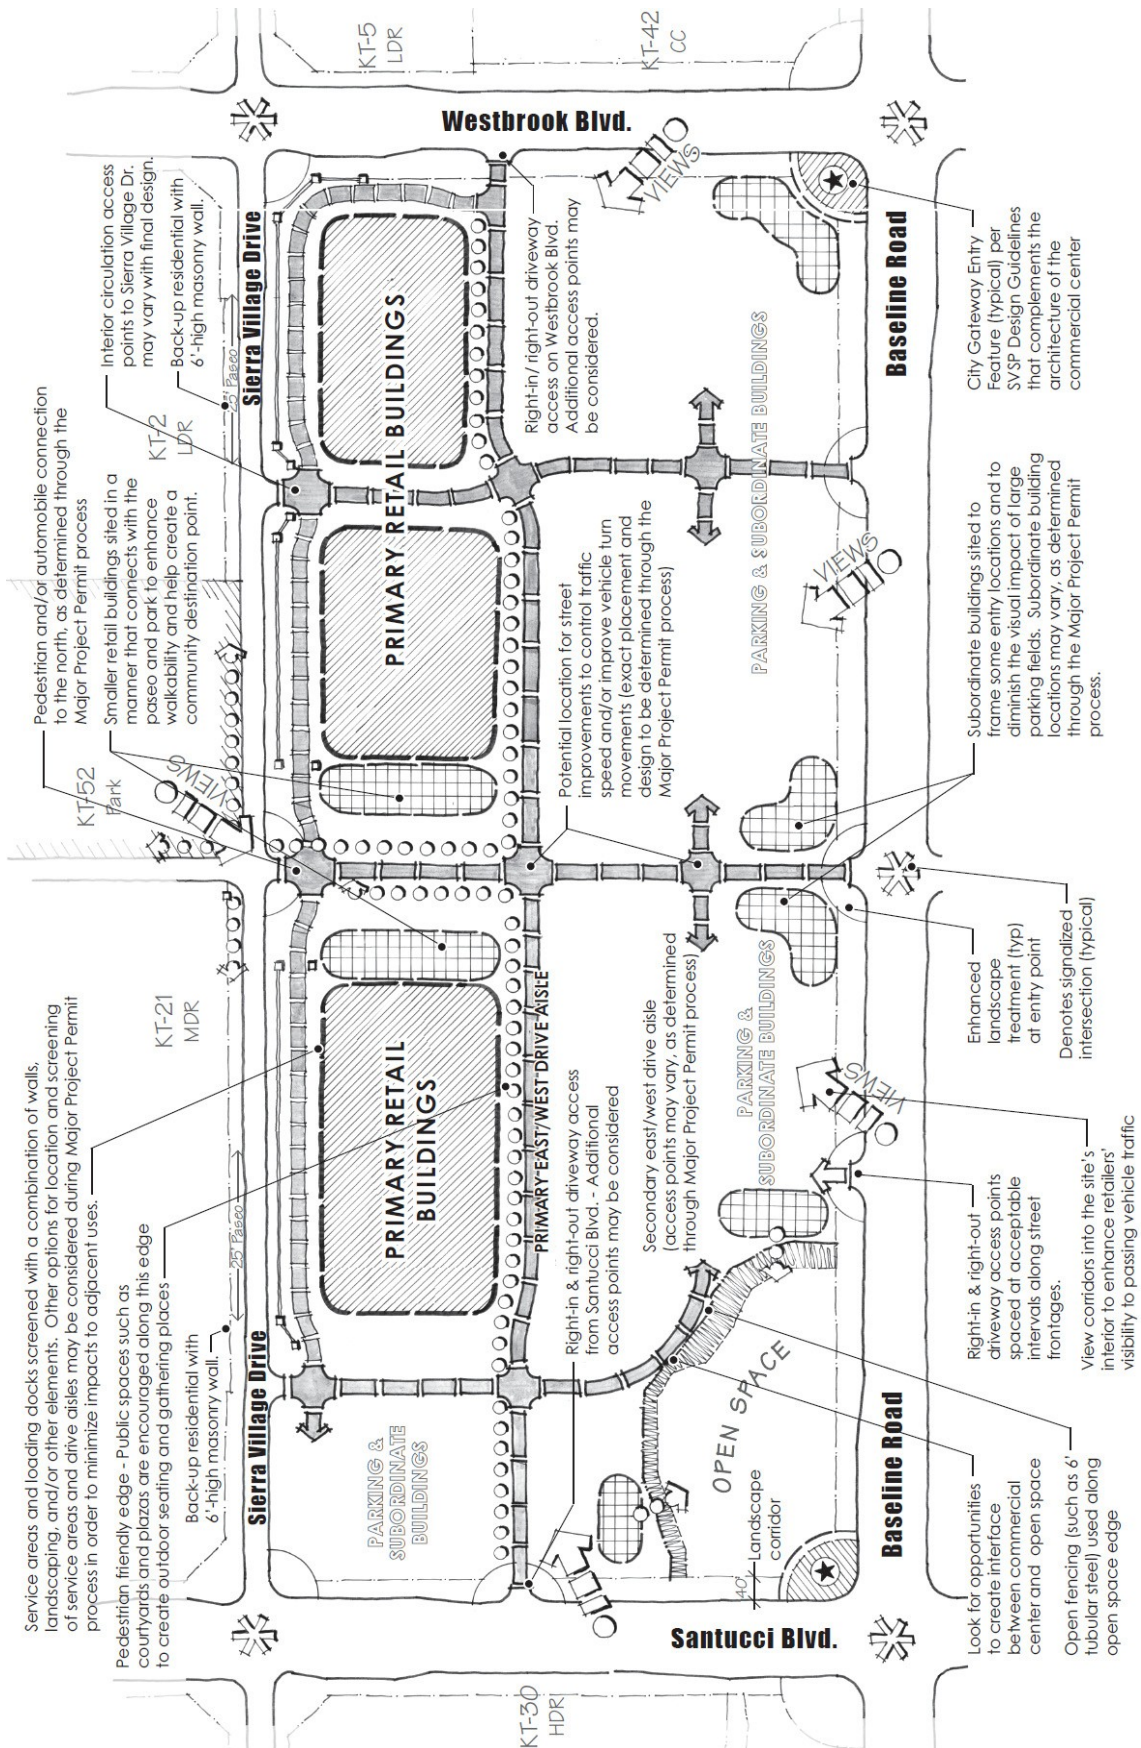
Concept Plan for Parcel KT-41A & KT-41B
